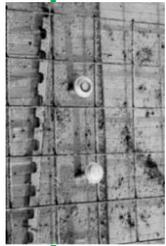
Construction measures – Weather protection by reinforced concrete-plates
